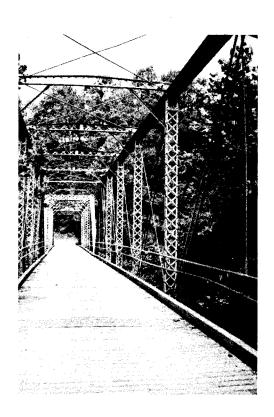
Groton Bridge & Manufacturing Company built this two-span Pratt truss in Russell County in 1889.
